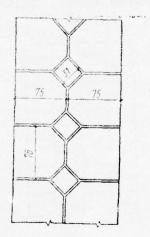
Pre-fab, concrete sidewalk pavement (type IV)
